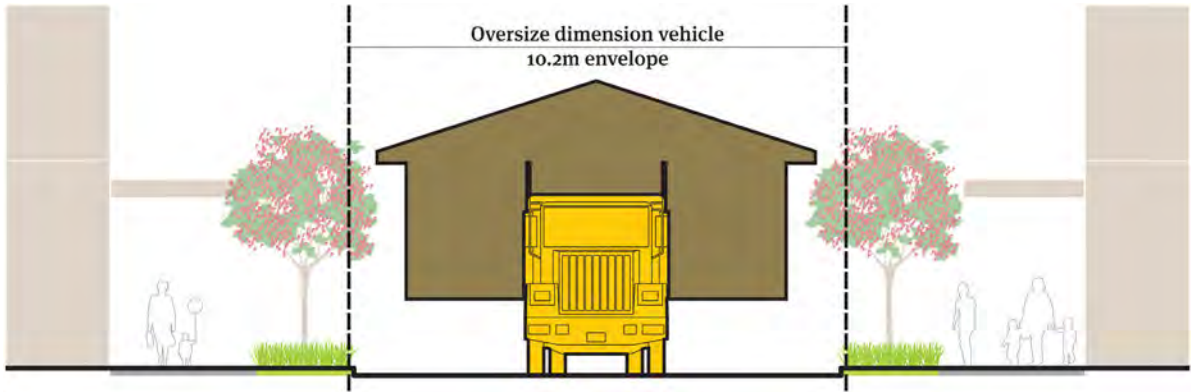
Wakefield Avenue / Marriner Street-west over dimension route with proposed street landscaping
